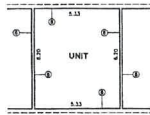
Proposed Draft Plan of Condominium File No. CD 24-02-8 - 1000641111 Ontario Inc & Oxford Standard Condominium Plan No. 109- 820-852 Alice Street, Woodstock
